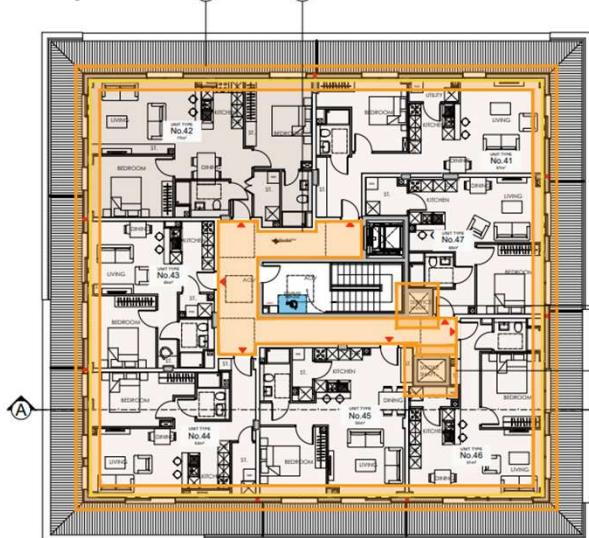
Existing Fifth Floor Plan – Extracted from Existing Scheme
